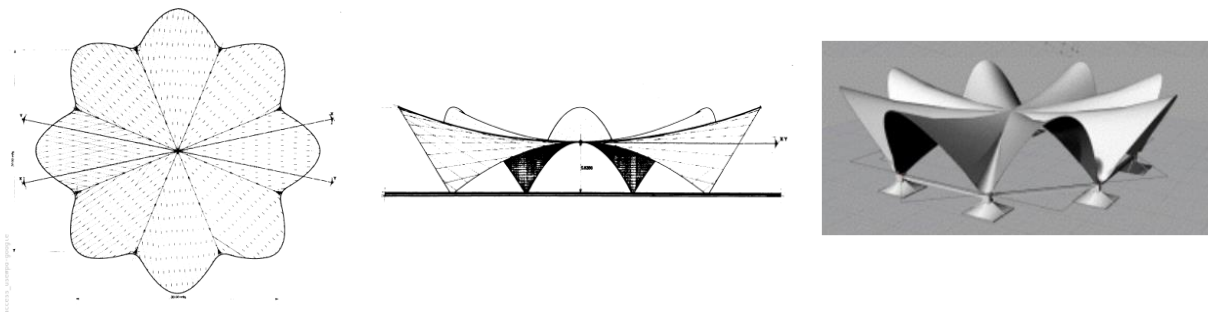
Los Manantiales Roof plan (left), elevation (center), and 3D model where the foundations and ties are appreciated (right).
